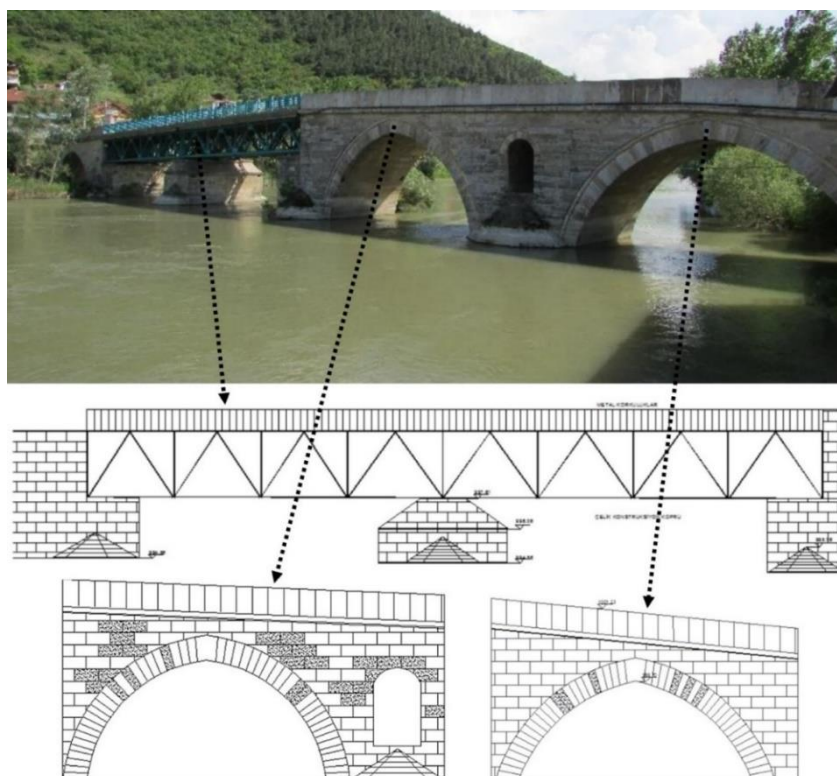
The steel truss and masonry arches of the bridge (Mihladiz & Sancak, 2015)
